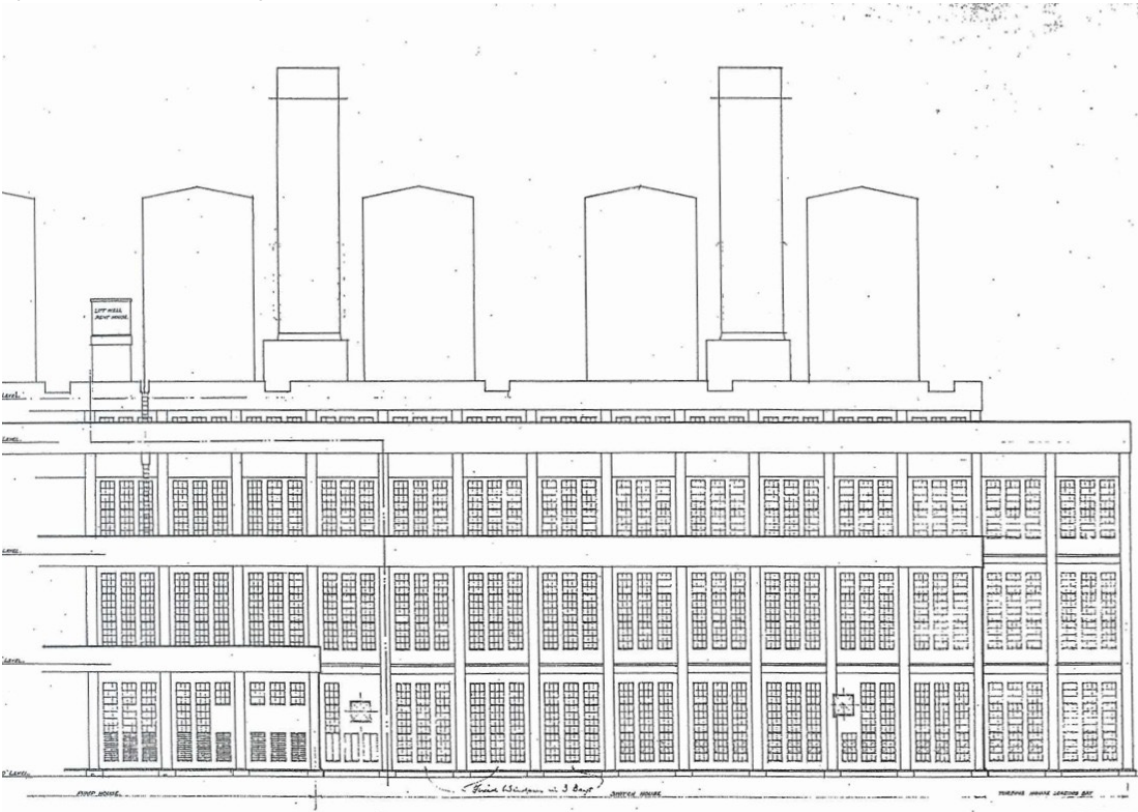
Archival Plan showing Part of West Elevation source: South Fremantle Conservation Plan (Ronald Bodycoat, 2003)
